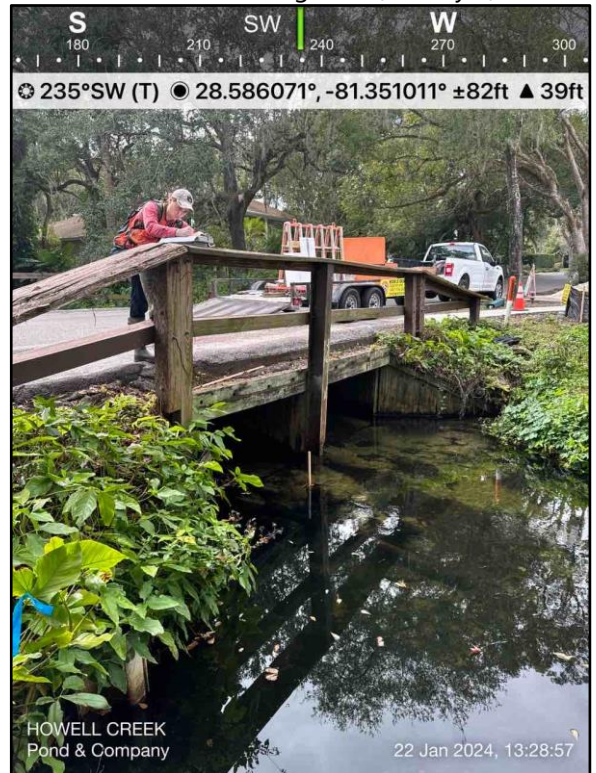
Structure 25; Concrete and Wooden Retaining Wall (Priority 0)
